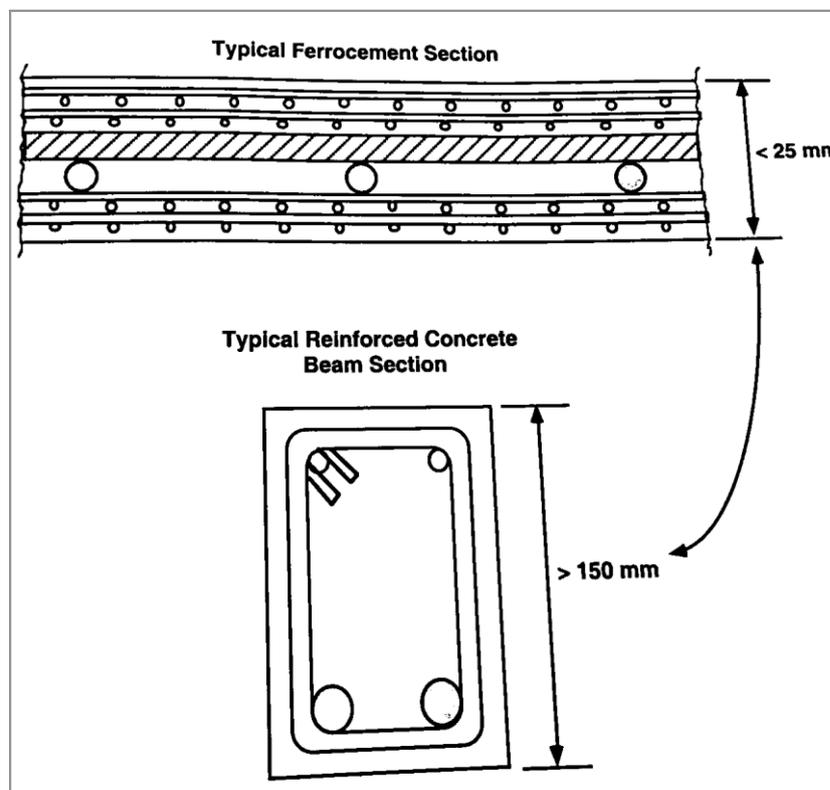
4: Typical cross section of Ferro-cement VS reinforced concrete
